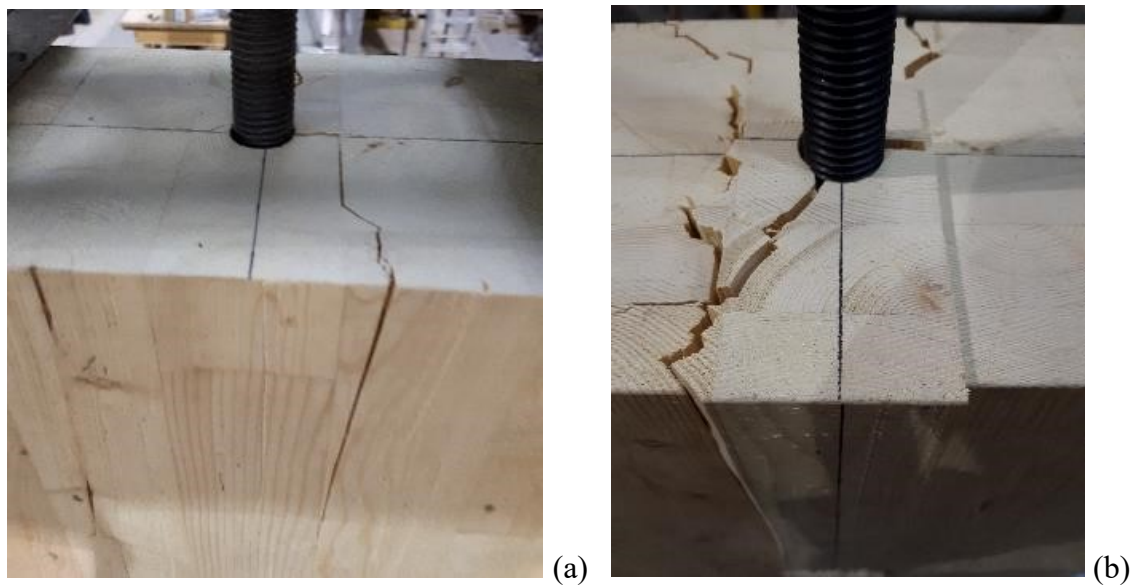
Wood splitting failure: (a) Wood splitting before final failure; (b) Rod pull-out failure after wood splitting.
